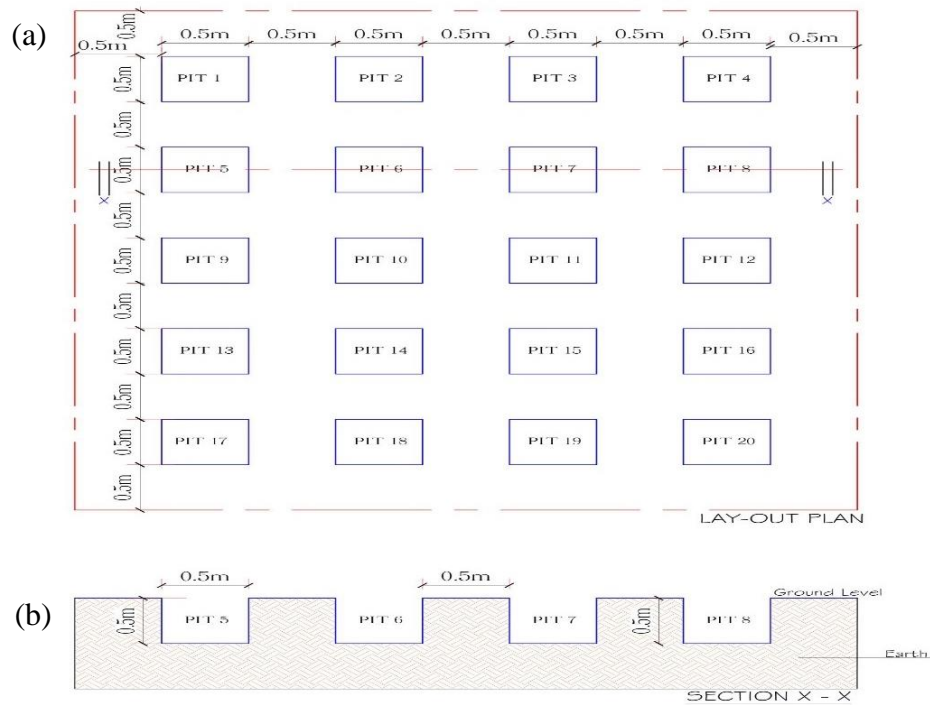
(a) & 3.2(b): Layout Plan of the Pits and Sectional View of the Pits respectively
